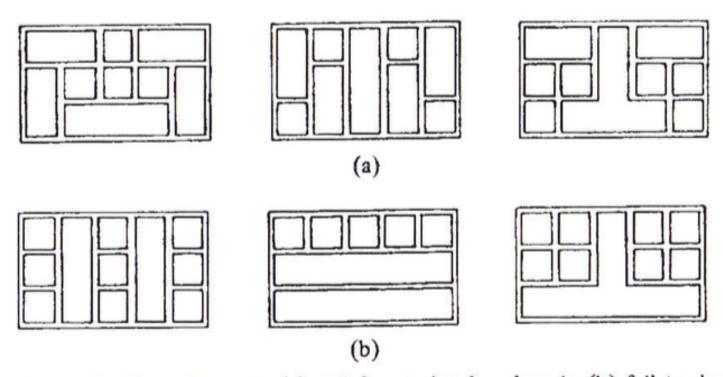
Plans shown in (a) satisfy proviso 1; plans in (b) fail to do so.
